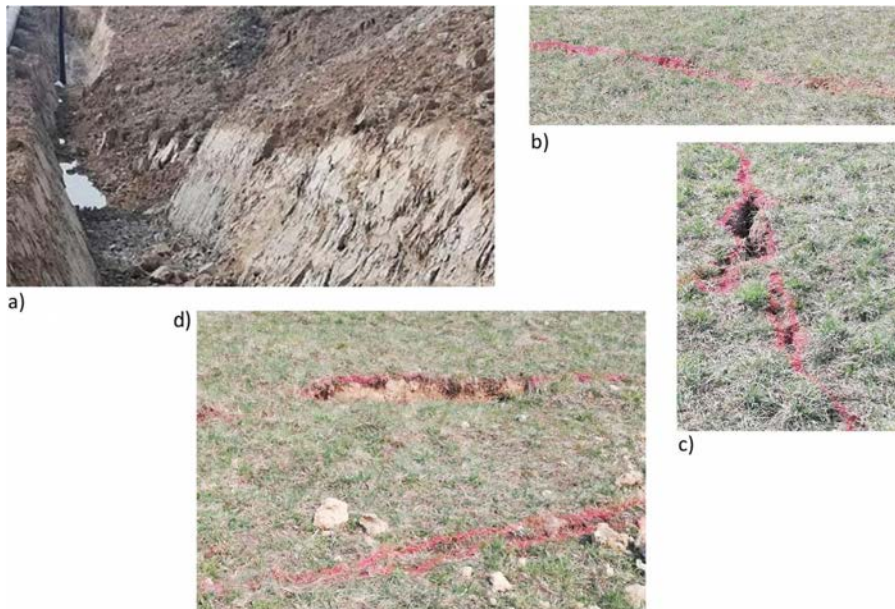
Landslide photo a) partially buried excavation b), c), d) cracks of the slope surface
